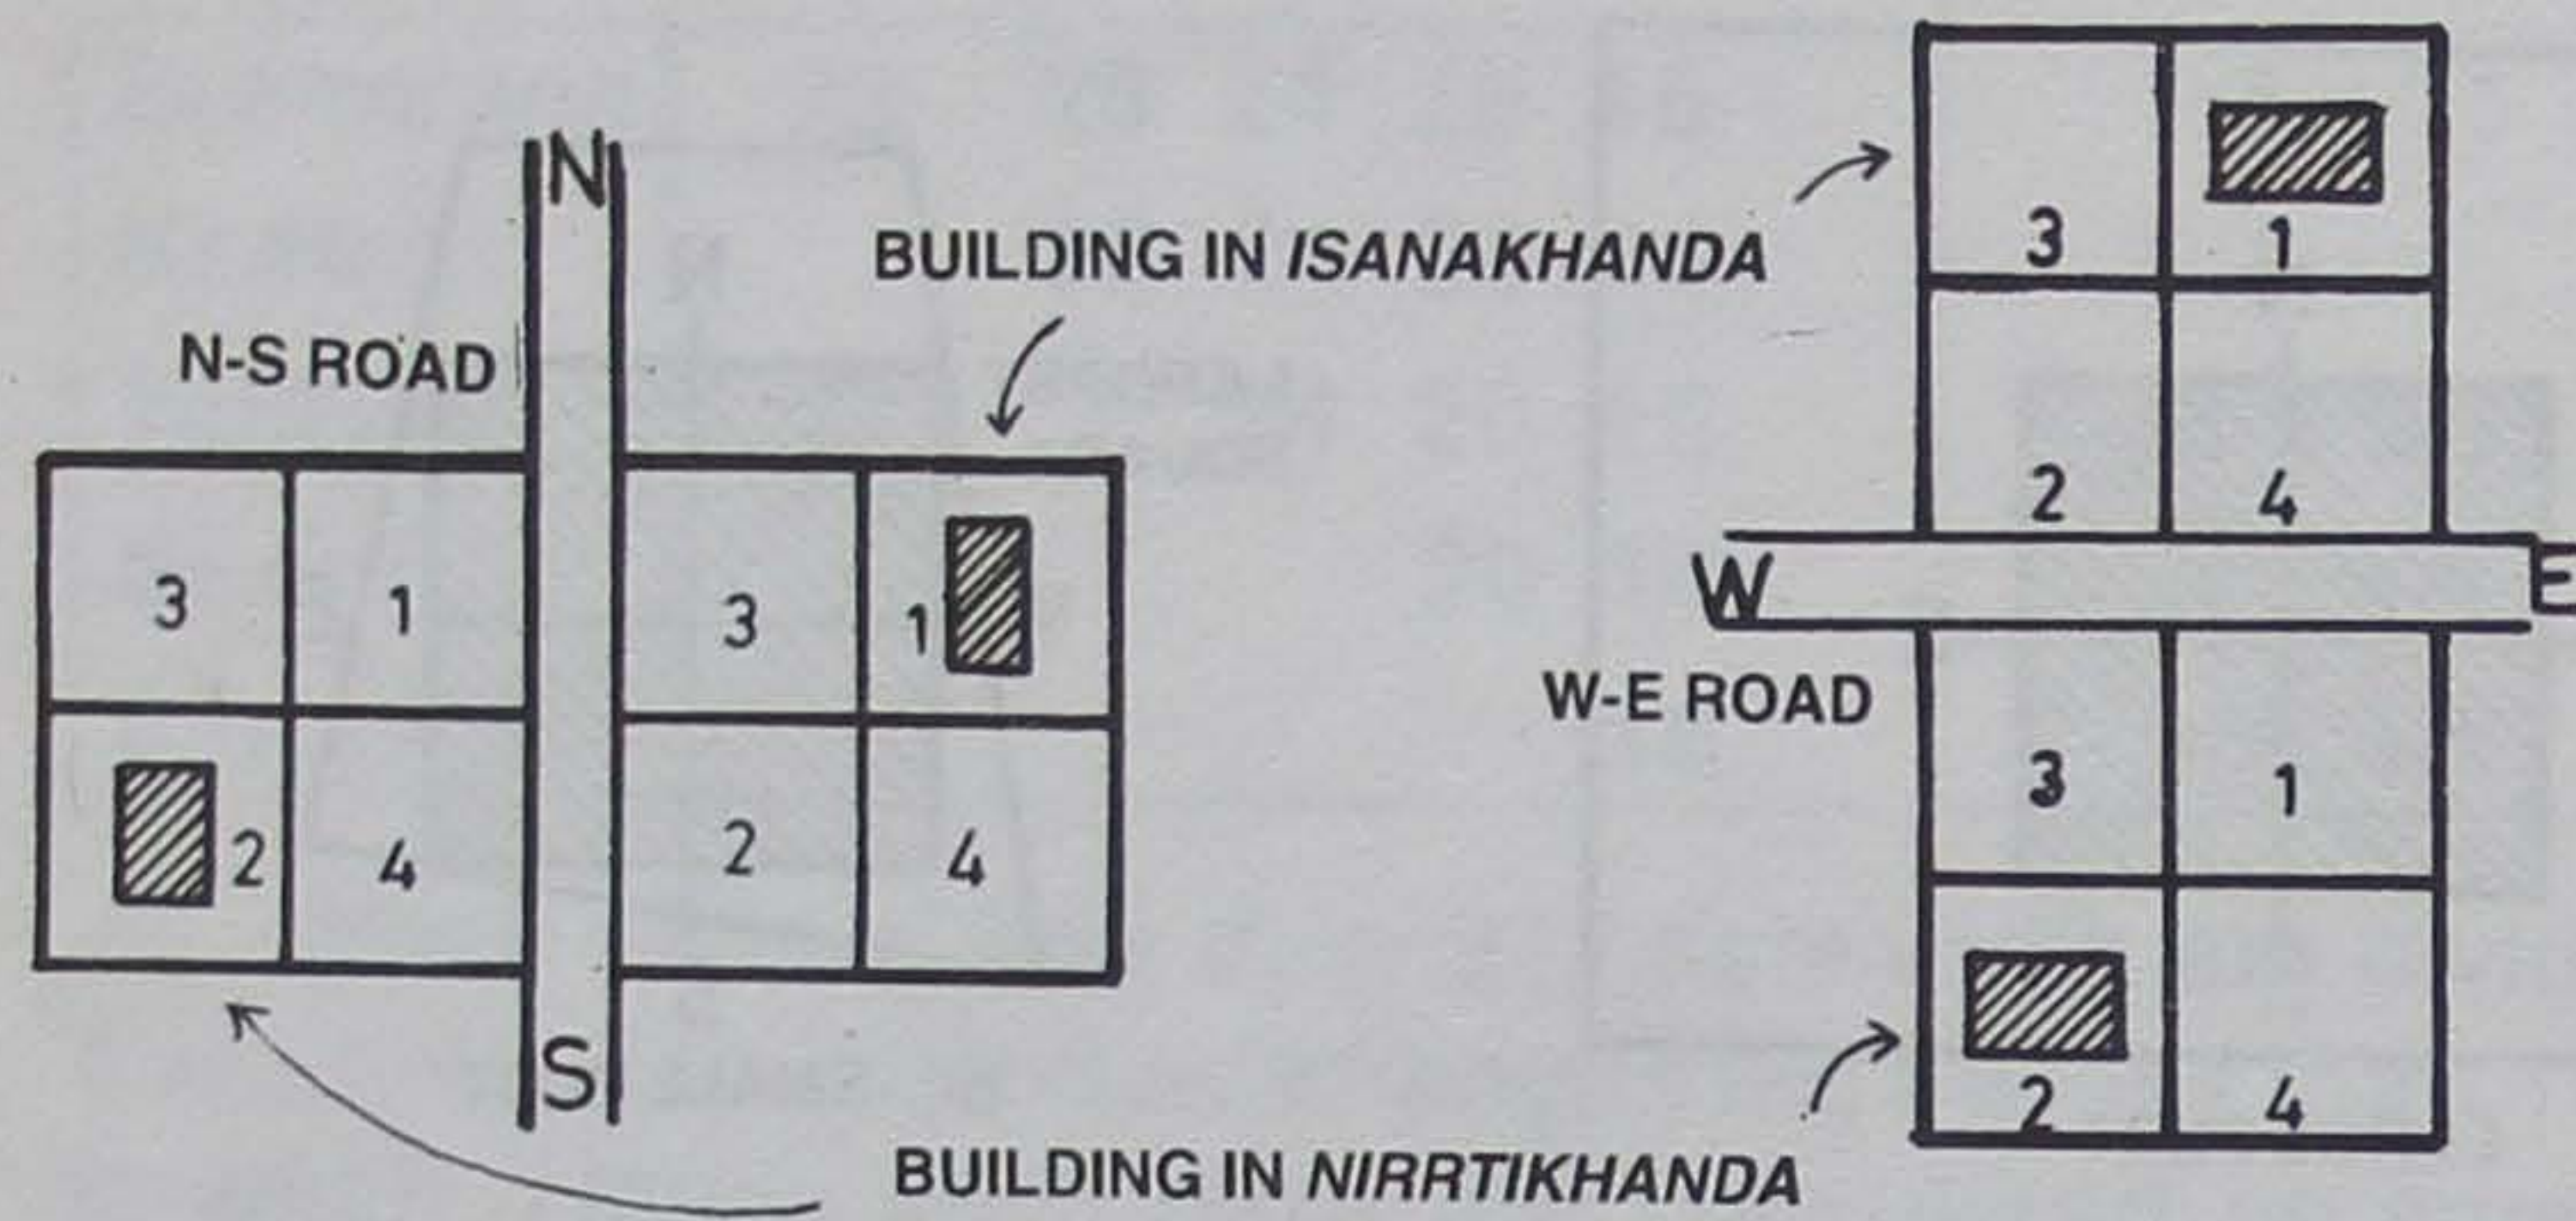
STAGGERING BUILDING LOCATIONS BY RESTRICTING TO SPECIFIED SECTORS.
